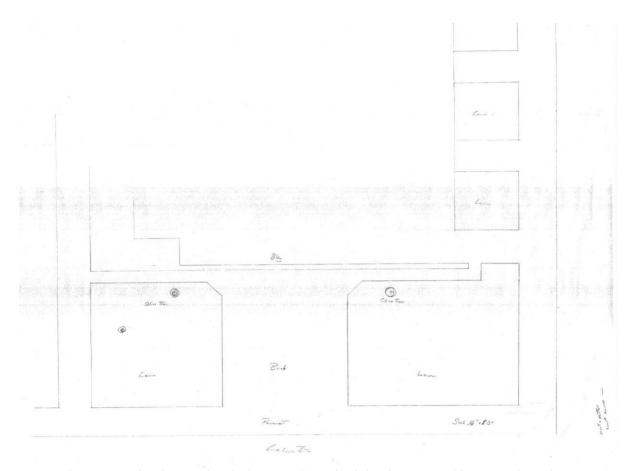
Front landscape sketch showing the as-built brick ramp and lawns at the Lobero Theatre entrance facing Canon Perdido Street. *Courtesy U. C. Berkeley Environmental Studies Archives. Lockwood DeForest collection* #1409. *LoberoTheatre.
